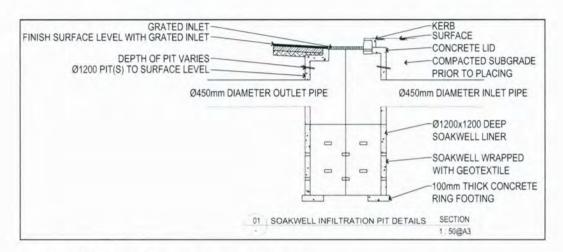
(above): Soakwell Infiltration Pit details.
